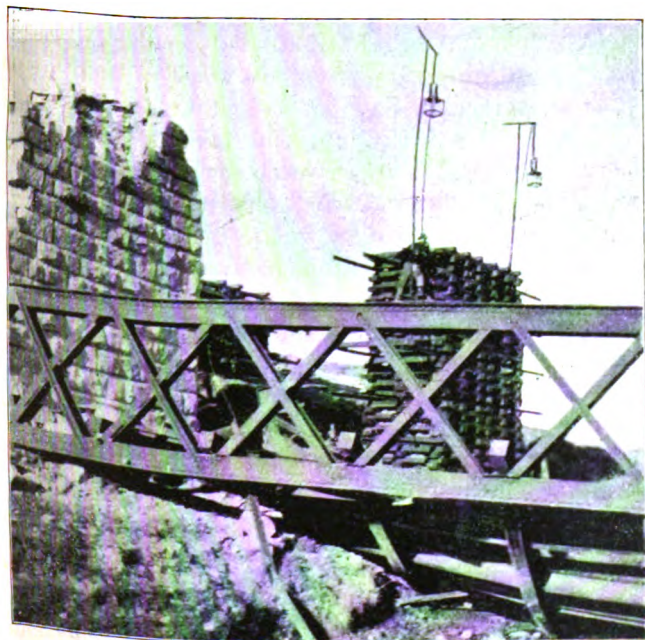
Rhenoster Bridge, showing Girder down, and Arc-lighting.
